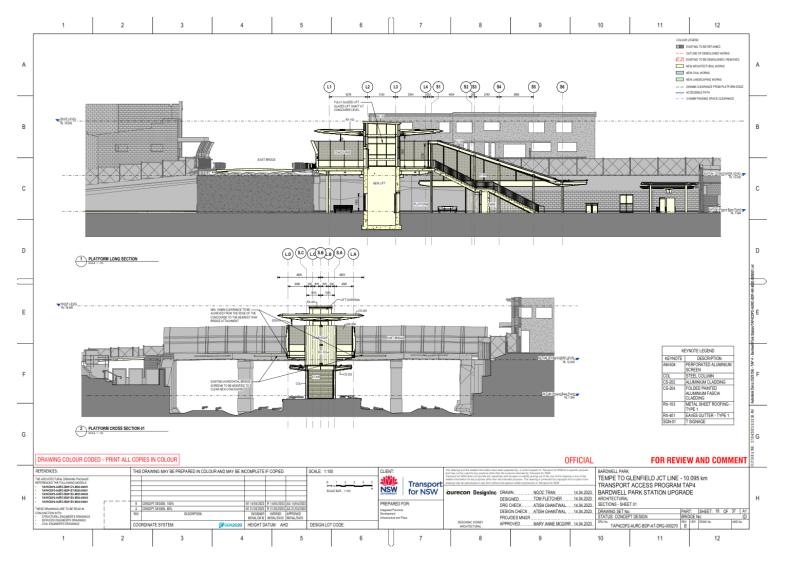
Proposed sections sheet 1 for Bardwell Park Station (Source: Aurecon, 2024)
